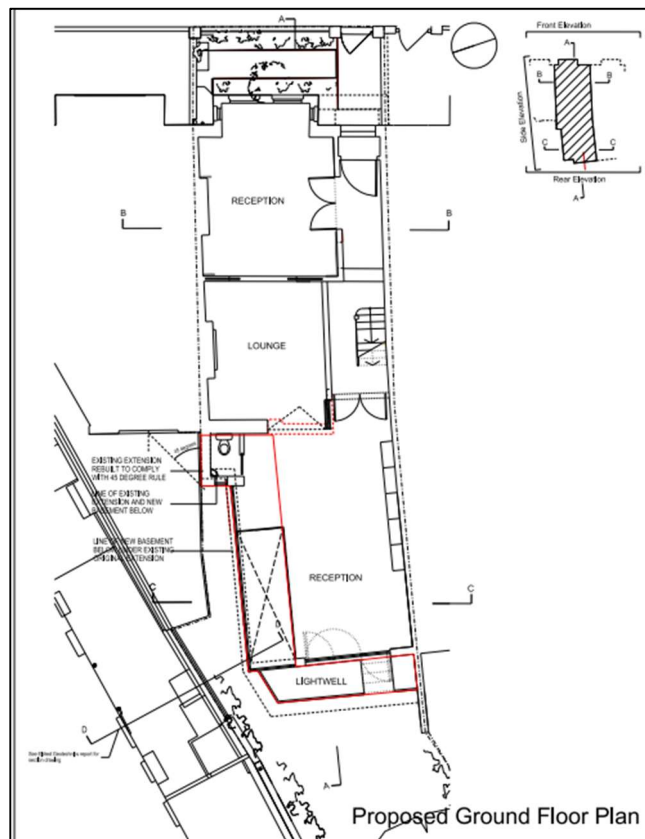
Proposed Ground Floor Plan from 2020/0927/P
